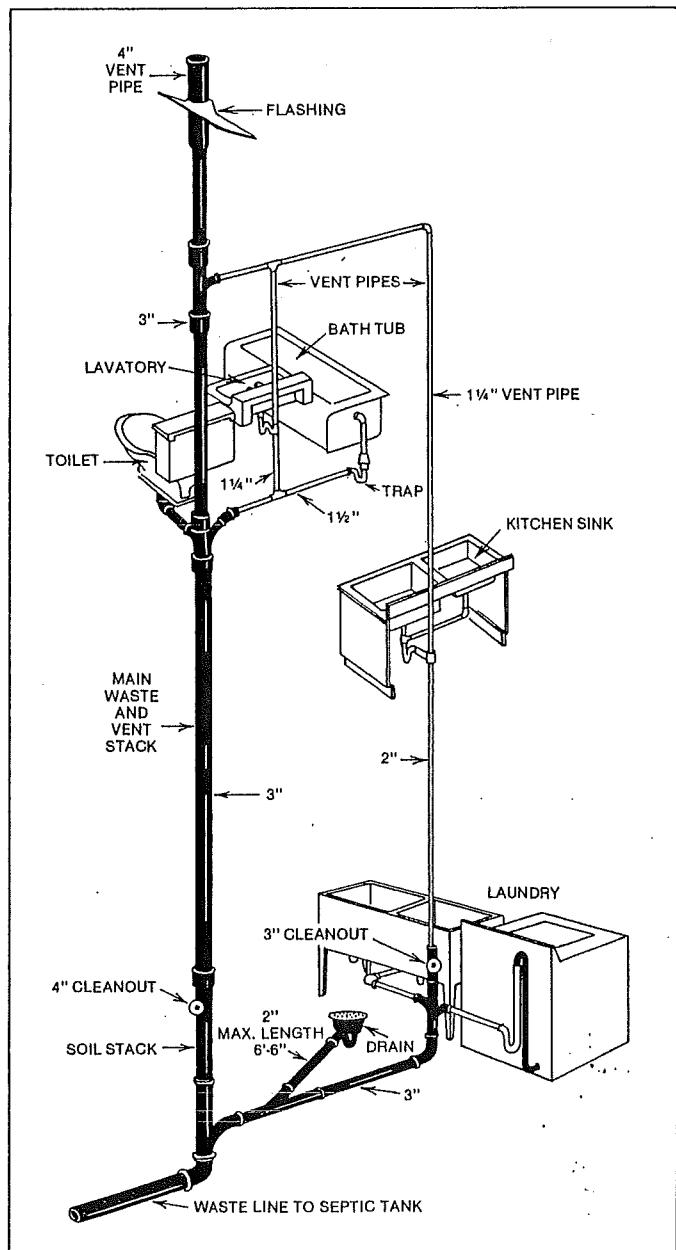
Housing Plumbing Includes - Waste and Vent Pipes and Plumbing Fixtures.
